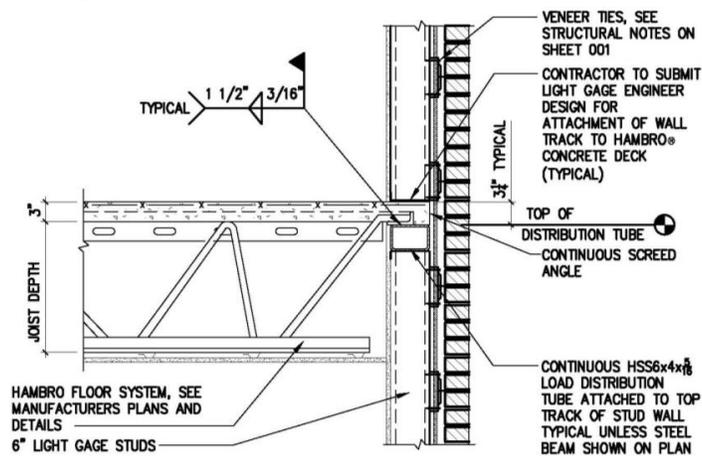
Exterior wall framing details. (Construction documents by Cates Engineering).
